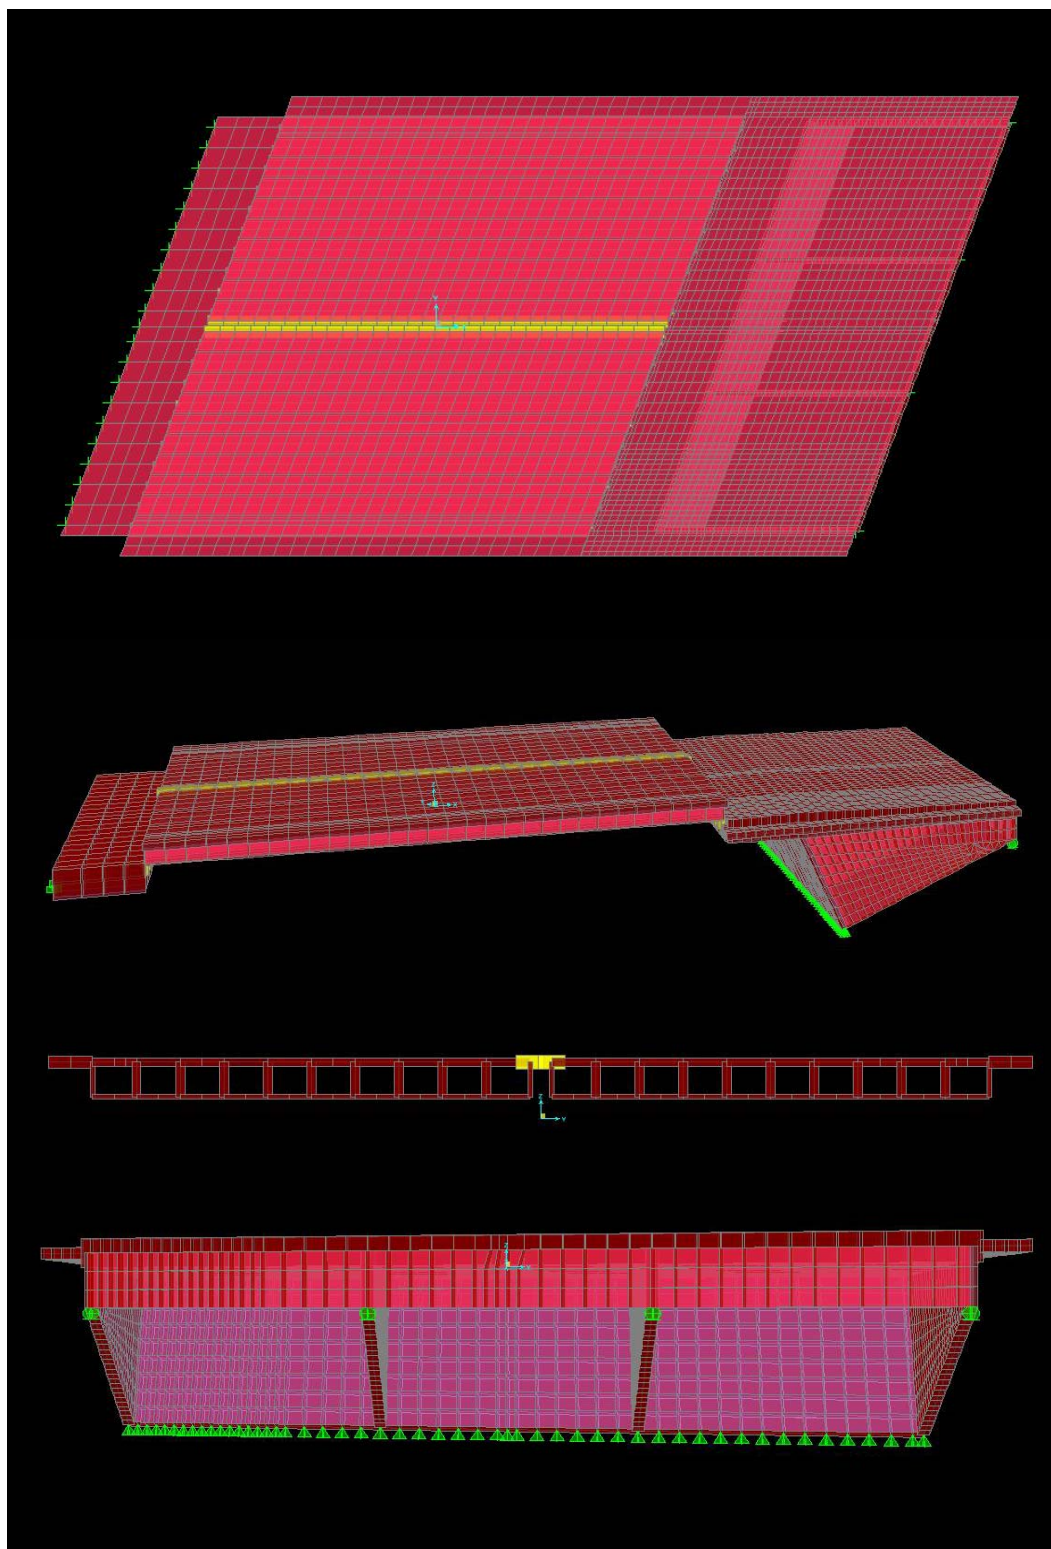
Illustrations of the 3-D analysis model: plan view, general view, cross section of the central span and view of the East abutment seen from the back side
